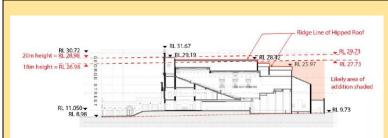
Section of the Roxy showing the existing 18m height control. While some of the existing building is above the height, the likely area where an addition is possible (shaded red) is below the ridge line of the existing hipped roof.
